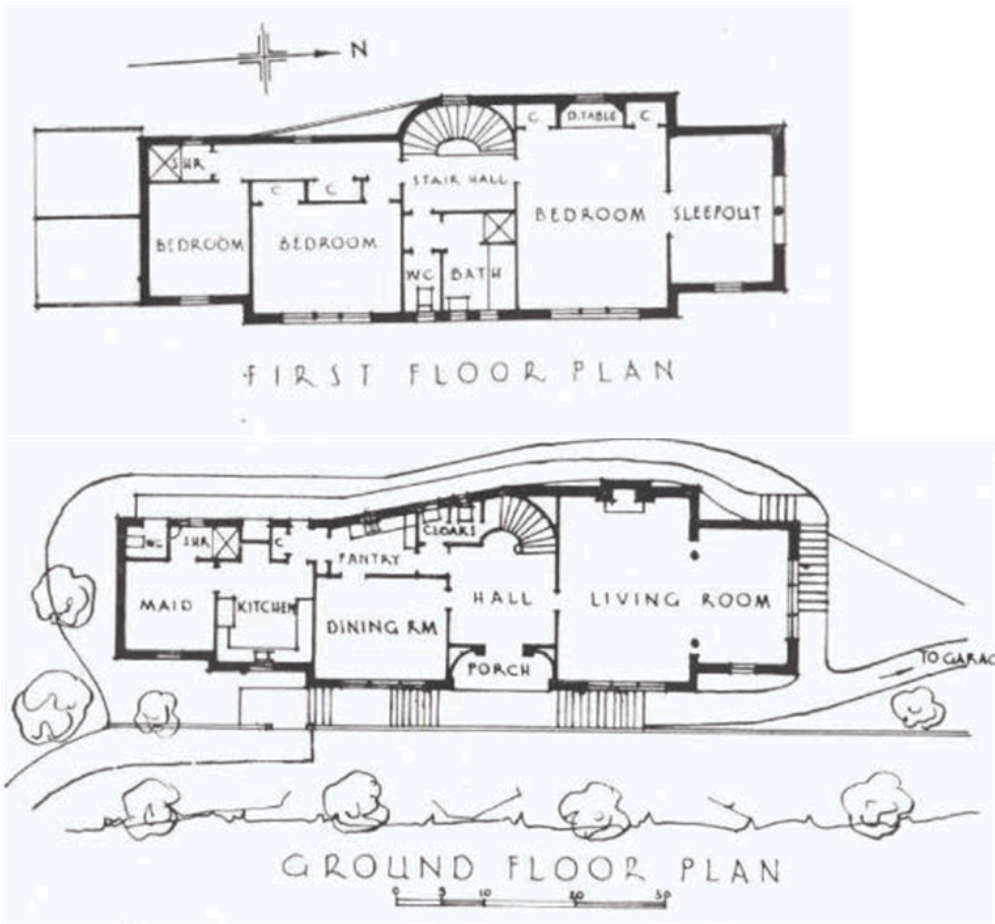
Floor plans, 30 Wyuna (identified as 4 Wyuna), c.1950s. (Source: *Domestic Architecture in Australia* p.78)
